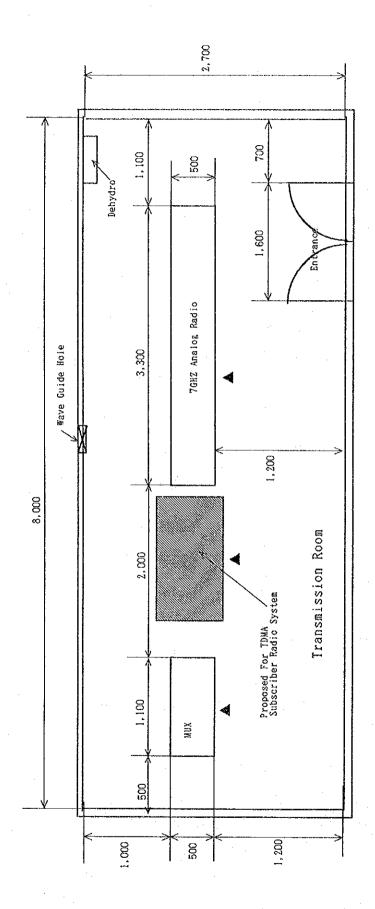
Equipment Layout Plan for NHLANGANO Exchange Office
